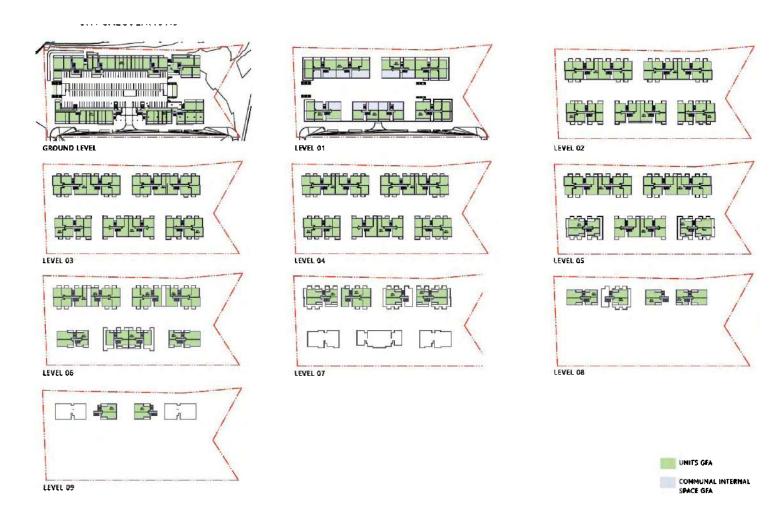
Gross Floor Area Diagrams (Source: Antoniades Architects).
